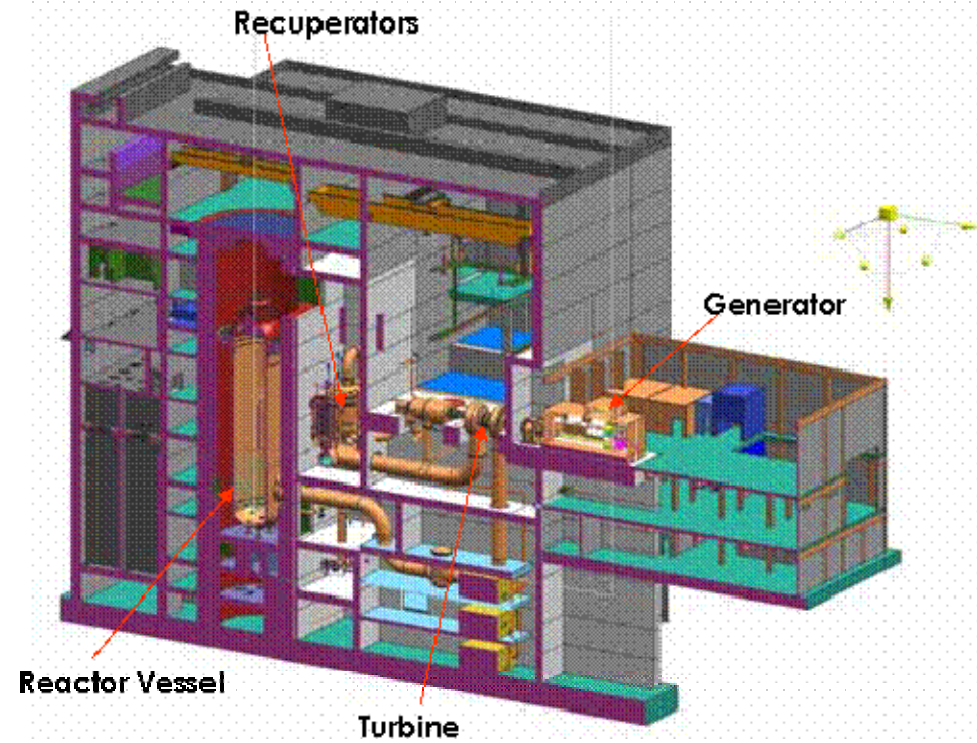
PBMR-400 design plant layout isometric [Ref. 34]
